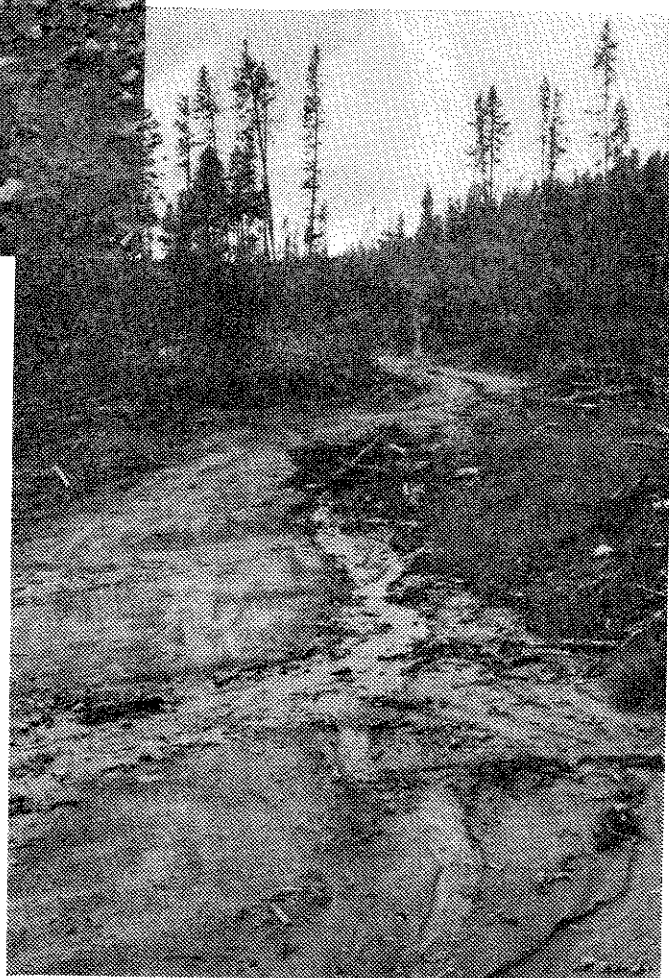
Gullying of road material into the Ten Mile Creek drainage.
